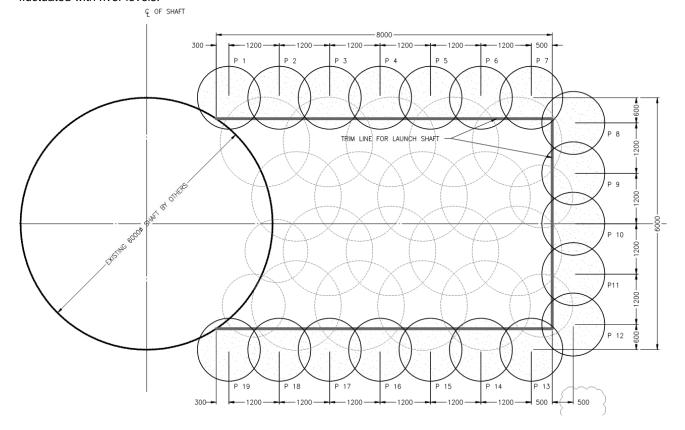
Plan layout of perimeter and bottom seal jet grout columns
